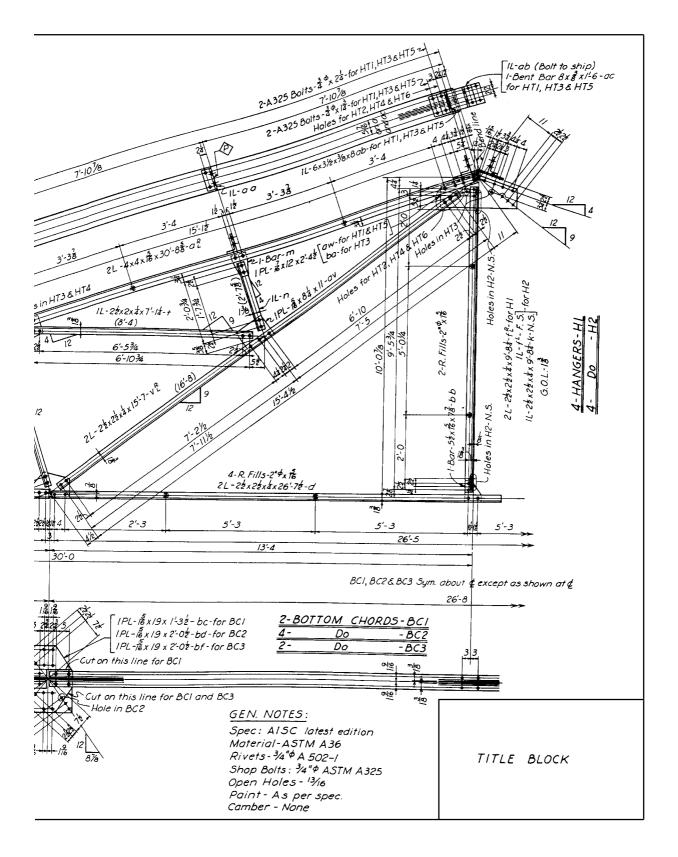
Trussed steel frame details. Copyright: American Institute of Steel Construction, Inc. Reprinted with permission. All rights reserved
